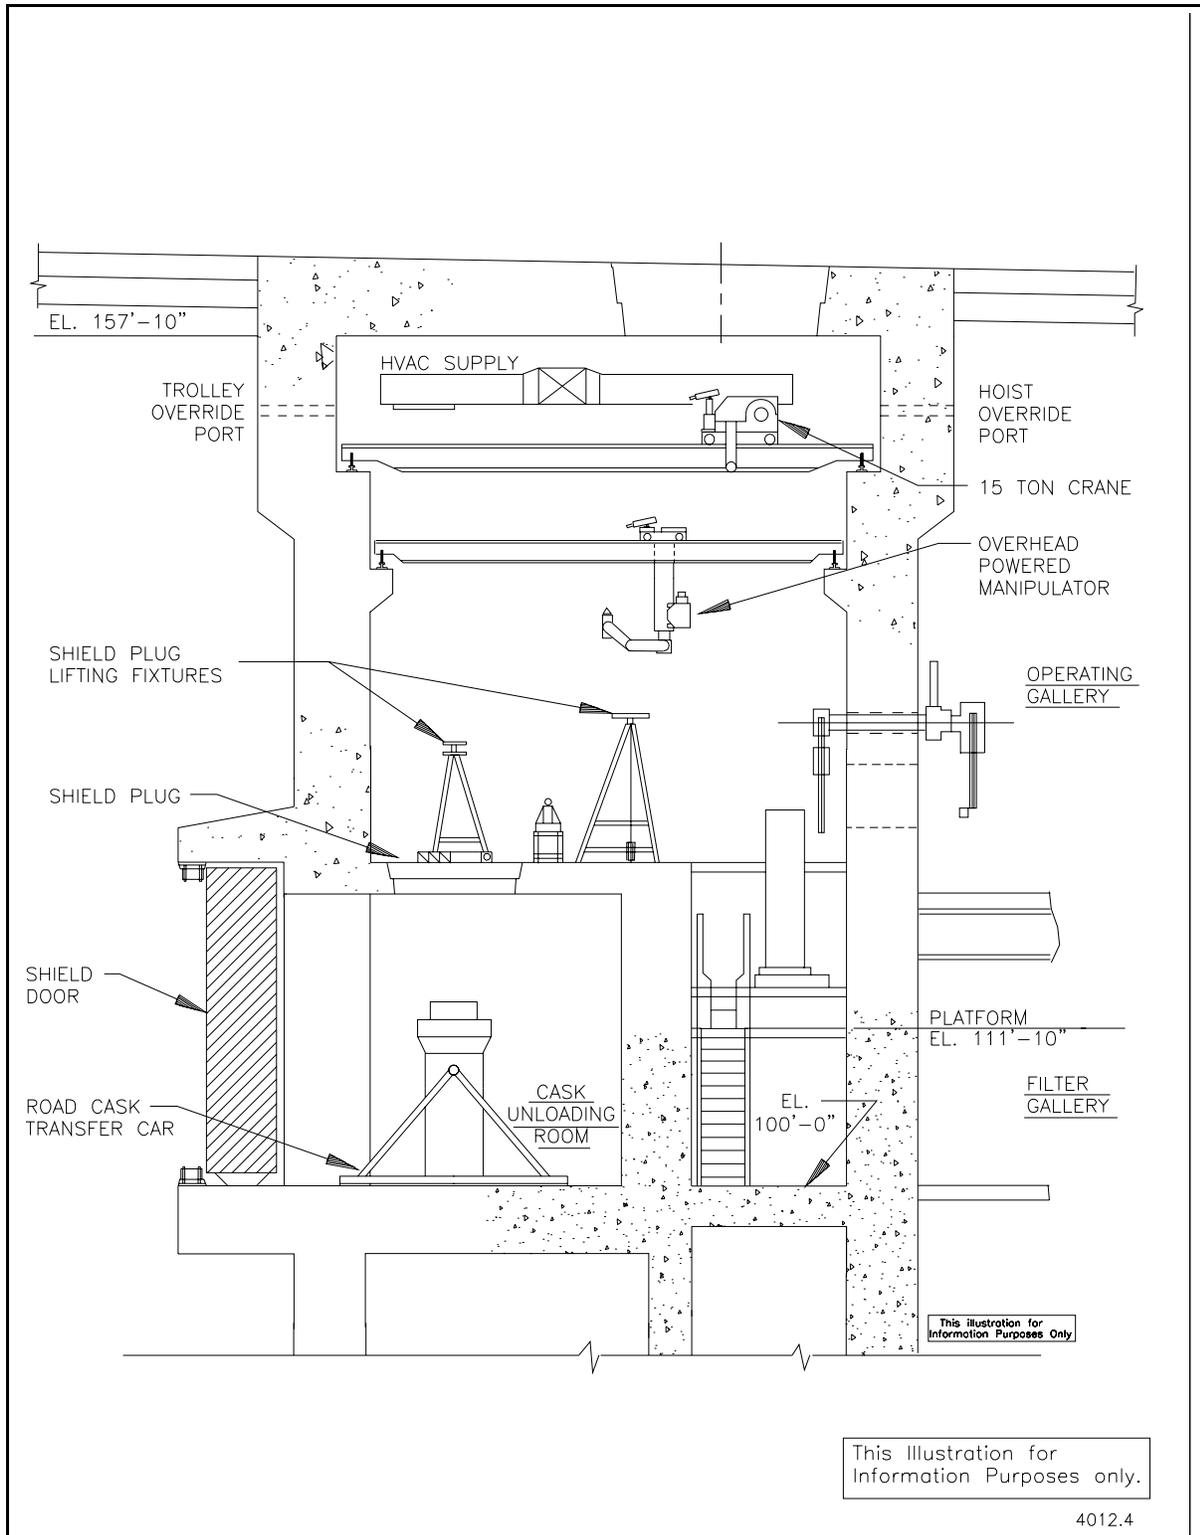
, Details of Upper Hot Cell at Cross Section E-E
